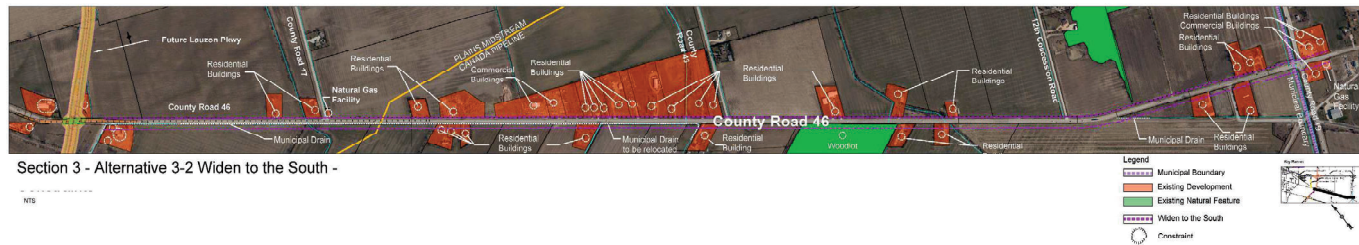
County Road 46 Section 3 Alignment Alternative 3-2
